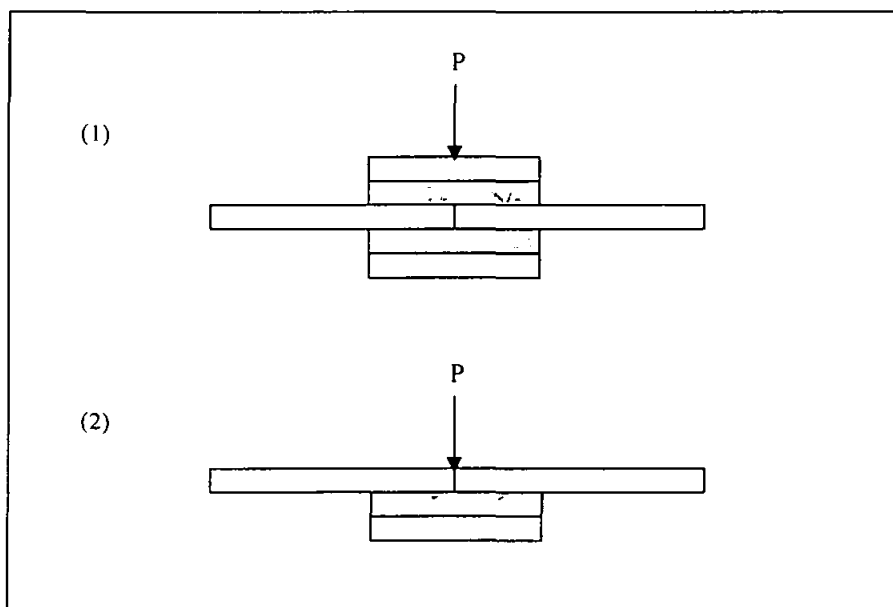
Arrangement of joint design and applied load subjected three-point loading
